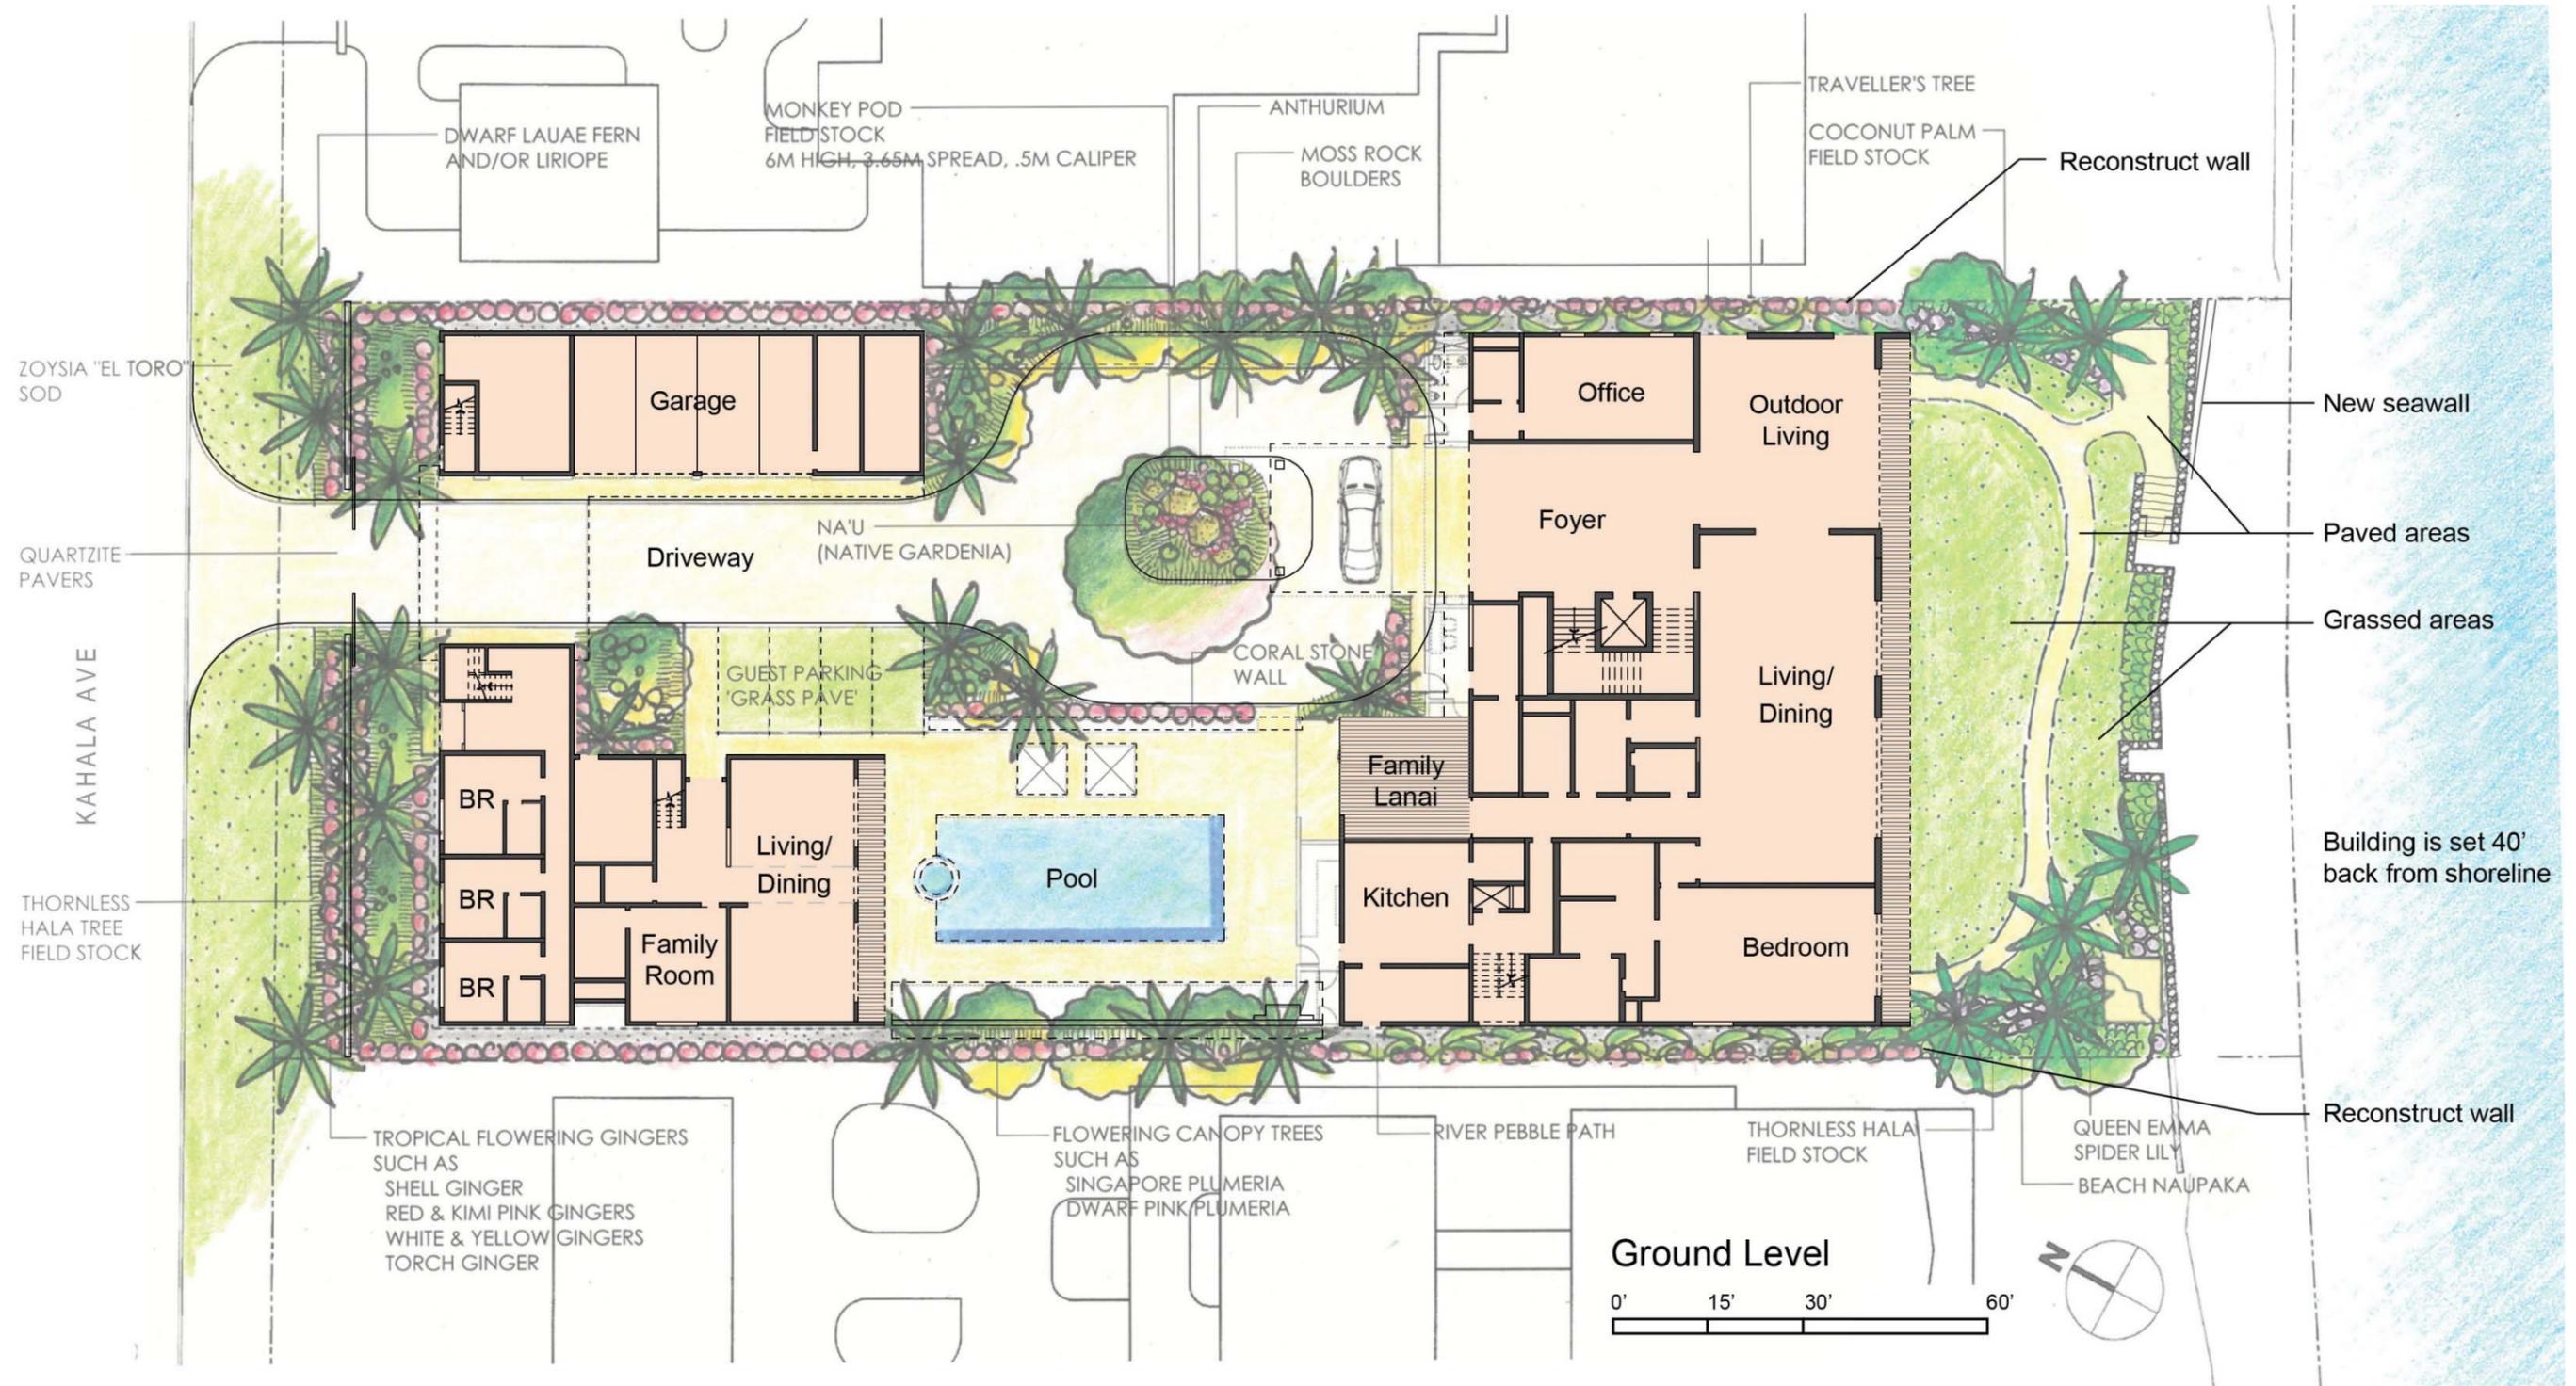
GROUND LEVEL AND LANDSCAPE PLAN (NOT TO SCALE) (2/7/14)
